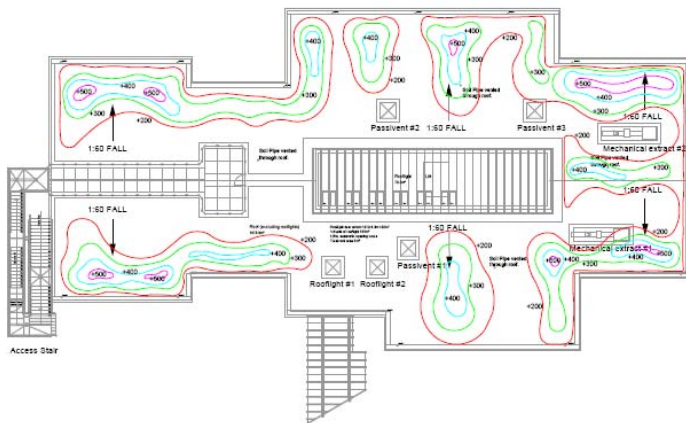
Contour plan for the green roof. The green roof is accessed by the external staircase to the left. A paved walkway and viewing platform enables school groups and visitors to visit the roof in safety. A large central skylight opens to the internal atrium of the school.
